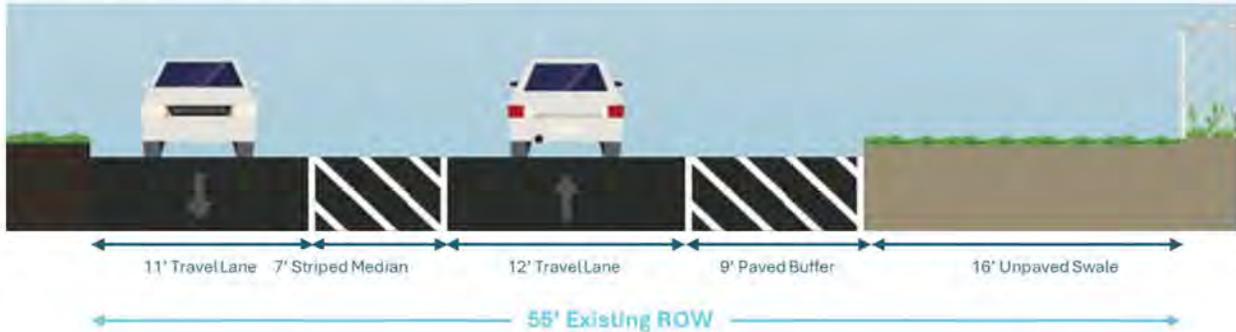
Existing Cross Section for E Dixie Highway, north of NE 214th Street
